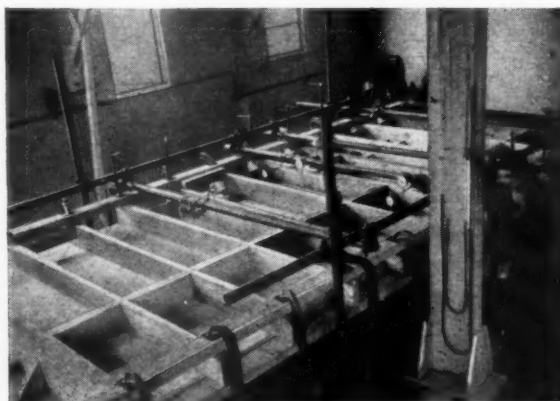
Rig for static loading tests. (Floor section is inverted, with captive airbag beneath for loading.)
